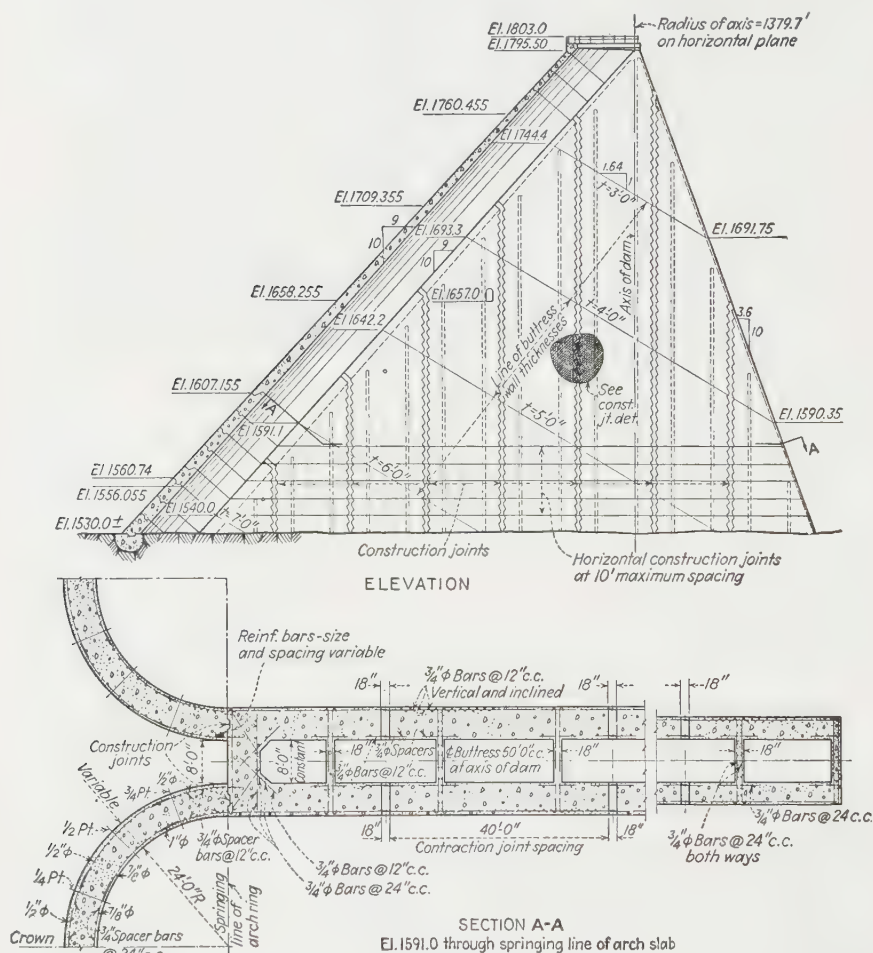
Bartlett Dam, bulkhead buttress and sections (inclined faces in vertical joints).
